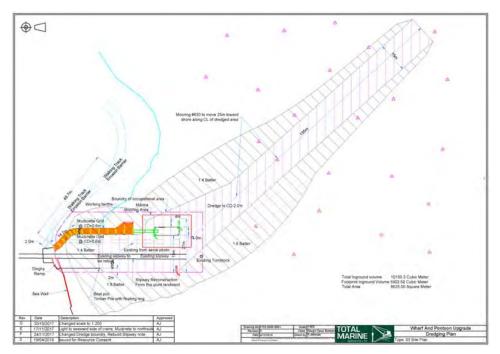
Site Plan Showing New Proposed Works Including Dredging
